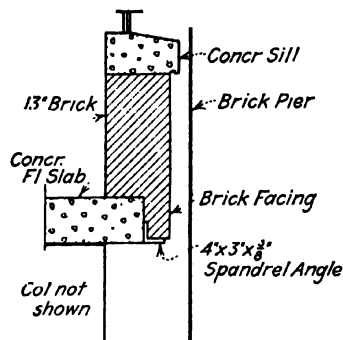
Brick spandrel wall and pier brick facing of lintel supported on spandrel angle.
